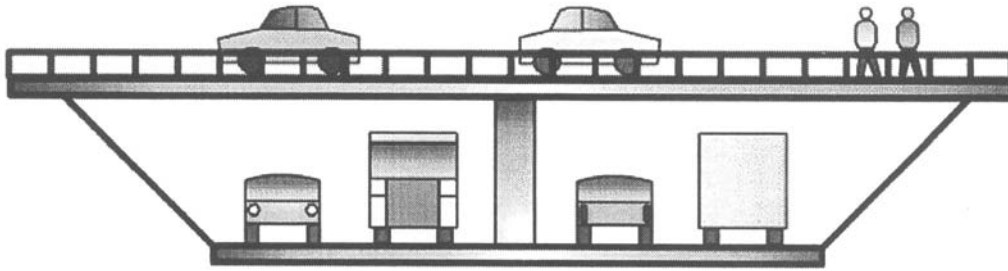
Overcrossing Bridges: Bridges which allow mainlines to cross under local streets or lower volume roadways. Example: Bridge No. 55043 (19th Street NW over TH52)
